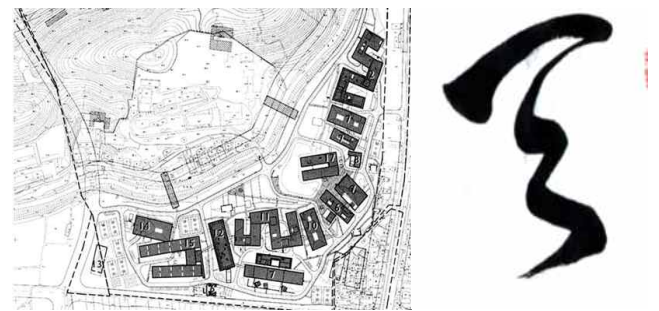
Xiangshan 2nd campus site plan and Calligraphy '天'
